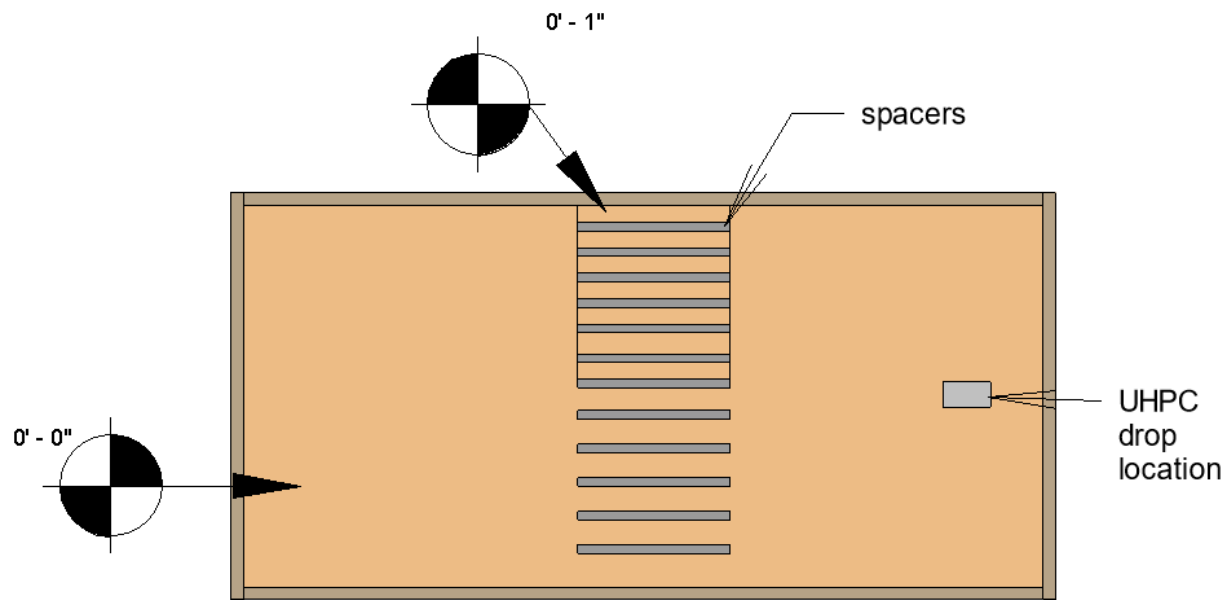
Plan View of Formwork for Slab F1 and F2 Showing the UHPC Drop Location
